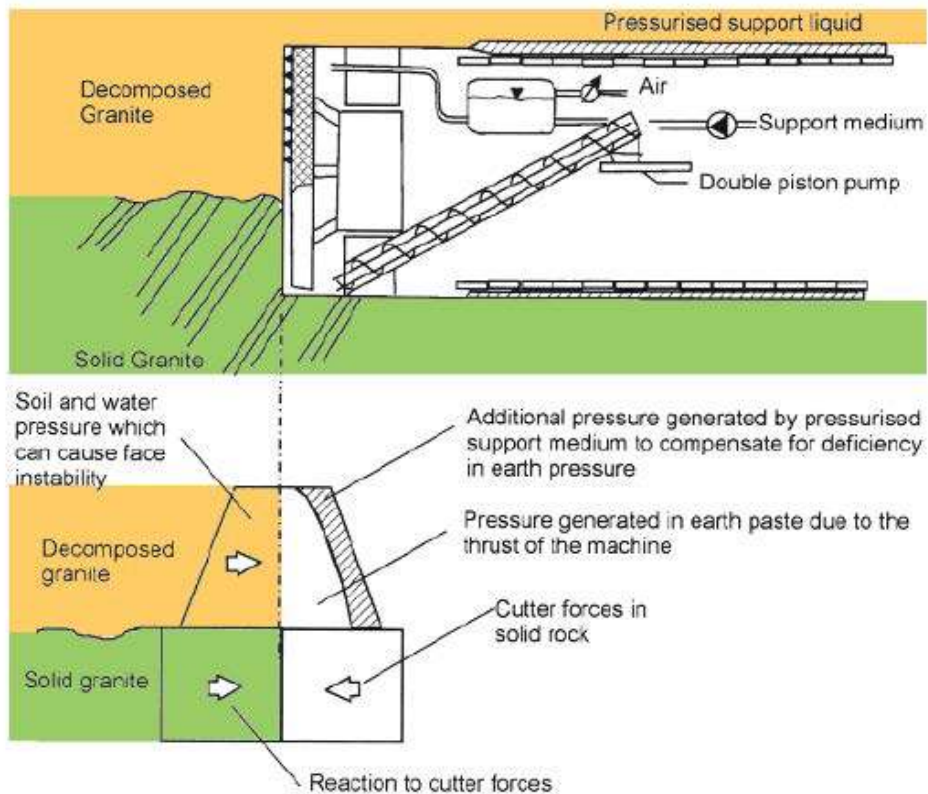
Mixed Face Tunneling Example (Babendererde et al., 2004)
